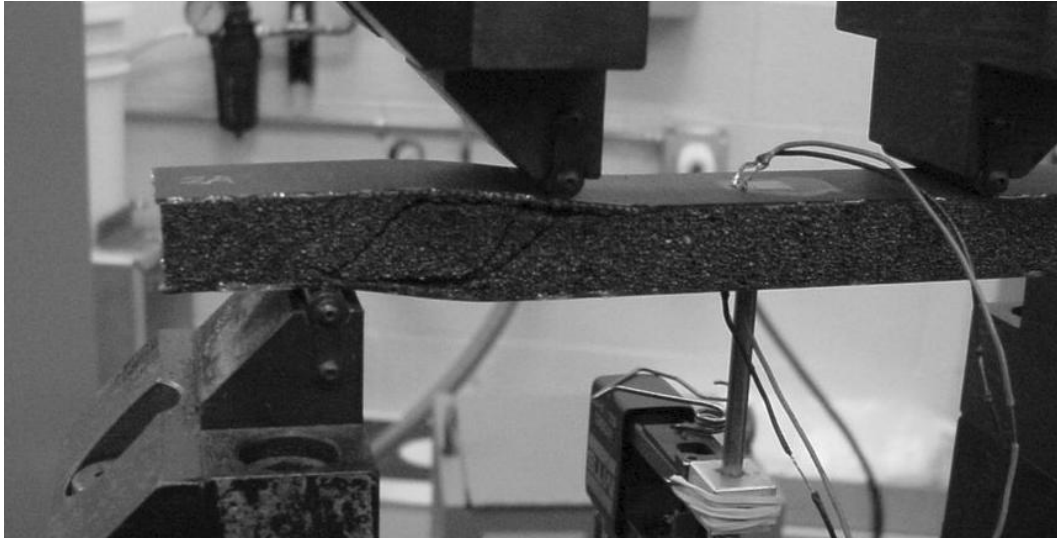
Secondary Shear Failure Due to Shear Stress in the Core (Specimen 4)
